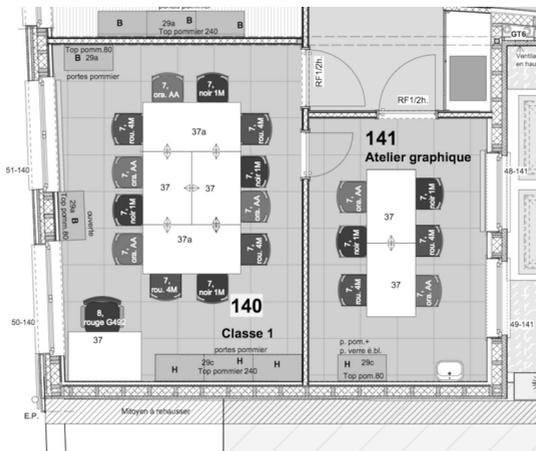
Architects' plan as built (09/04/14), now designed as two workshop rooms with storage furniture. Courtesy of Pierre Lenders & Antoinette Defay.
